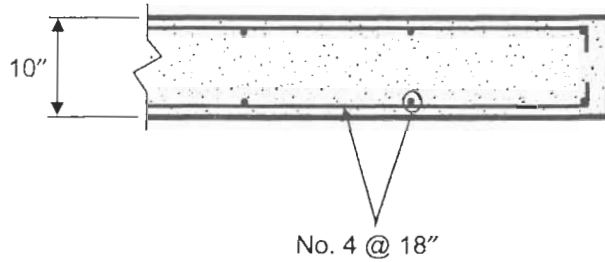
Reinforcement Details for Shear Wall No. 5 (SDC B)
